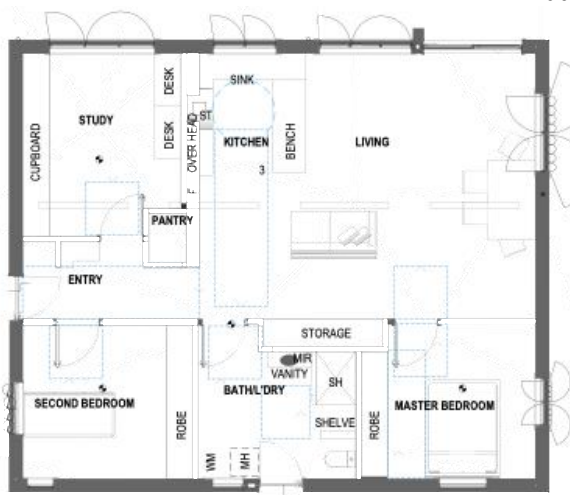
Floor plan and external wall area data of the case study building. (source: Authors)
